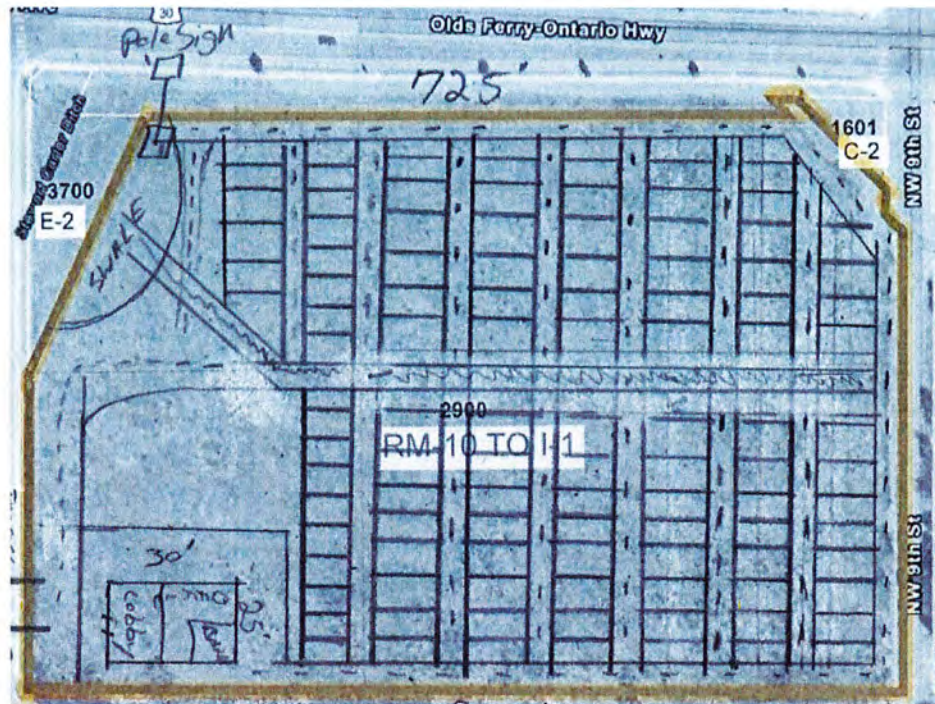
Rough Site Plan for Proposed Indoor Storage Units
